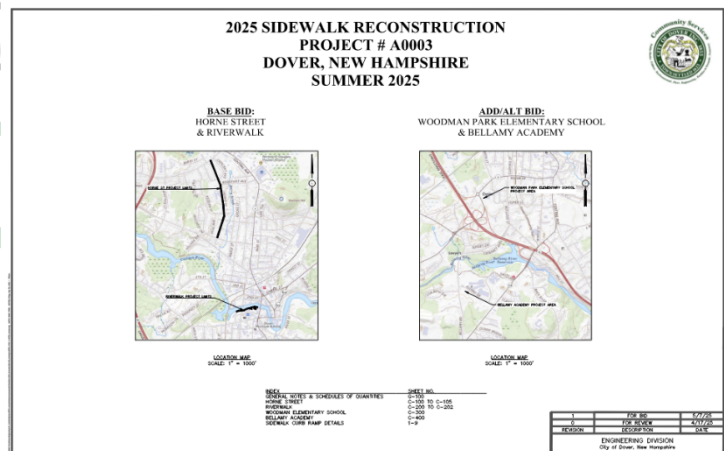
Sidewalk Reconstruction Drawings prepared by City Engineering Staff.
